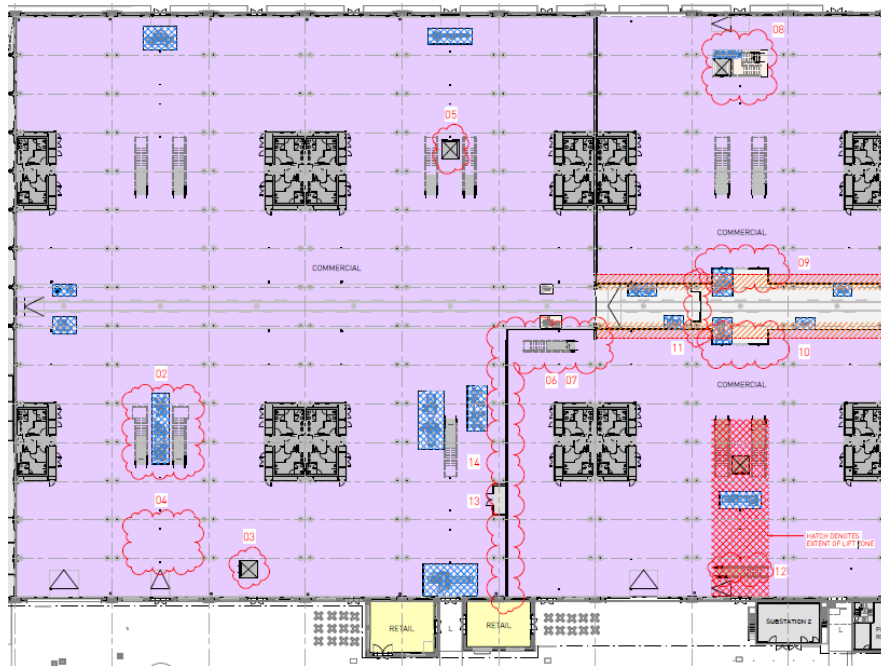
Approved Ground Floor Plan (Source: Sissons, 2019)
